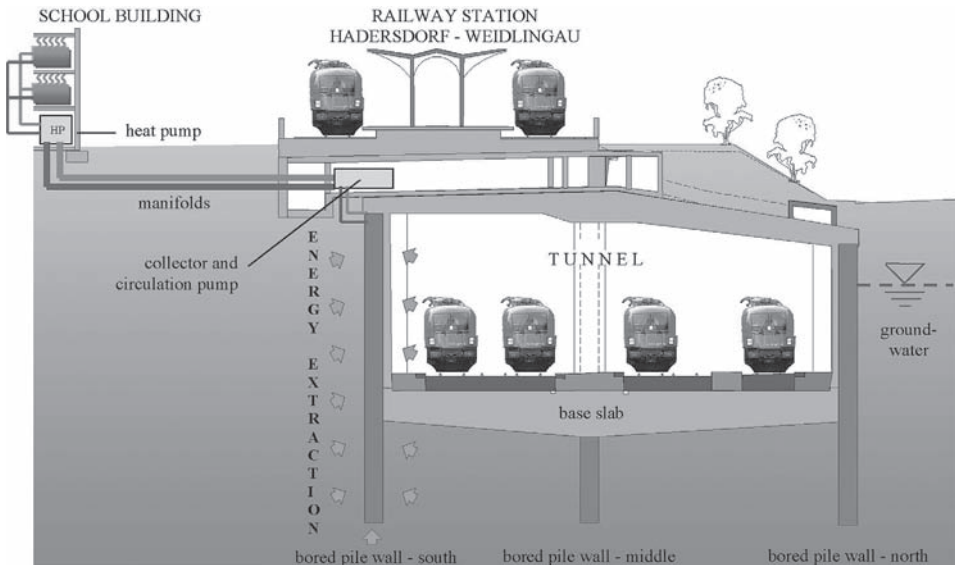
Schematic cross section of an energy plant as thermo-active tunnel ("energy tunnel"). One side wall of cut-and-cover tunnel used as energy wall. Bored pile walls (south-middle-north).
